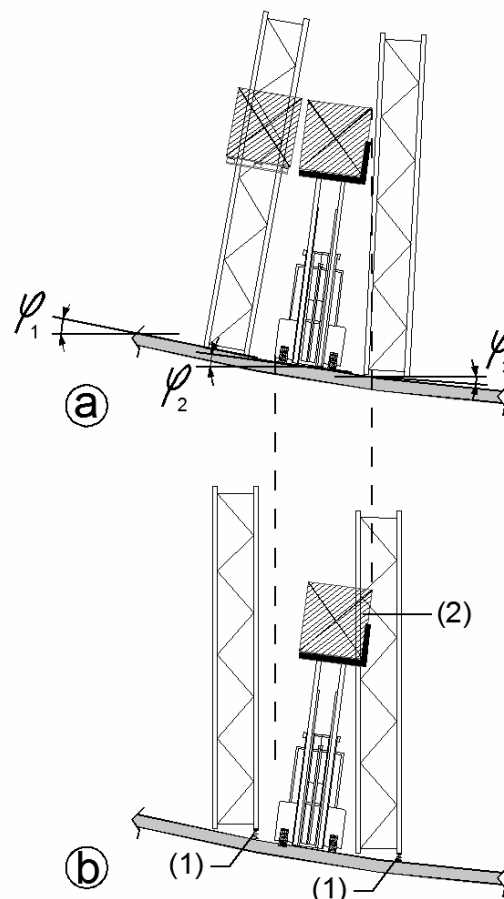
Example of a discontinuity in floor slab support at locations of building column foundations in case of a ground bearing floor,
